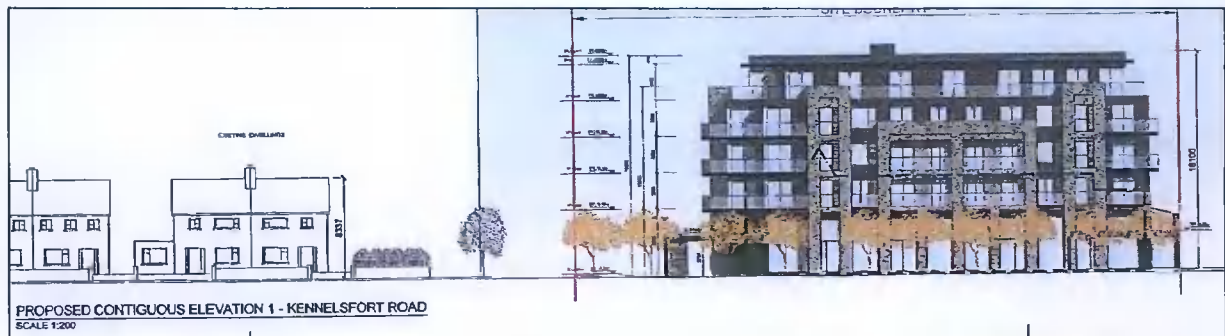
Proposed 5-storey building elevation from Kennelsfort Road (east of development)
